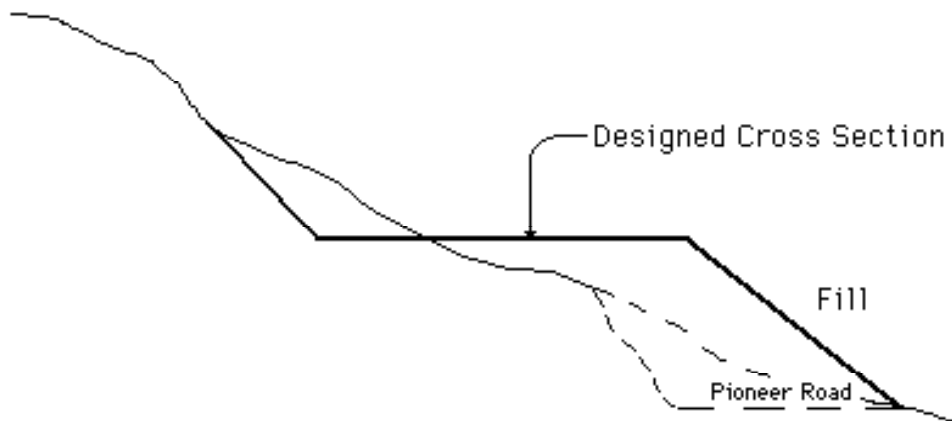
Pioneer road location at bottom of proposed fill provides a bench for holding fill material of completed road.
